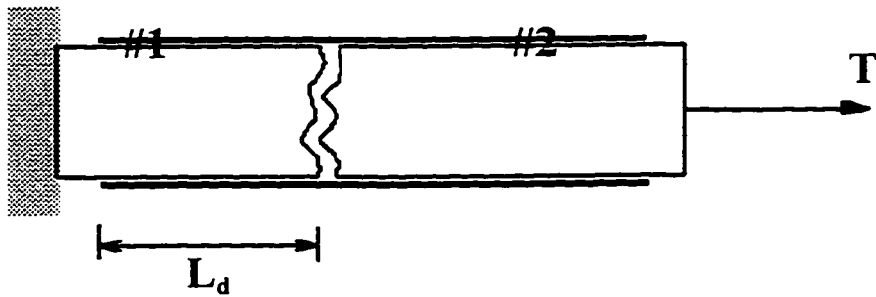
Cracked Concrete Block - load carried by CFRP sheets
